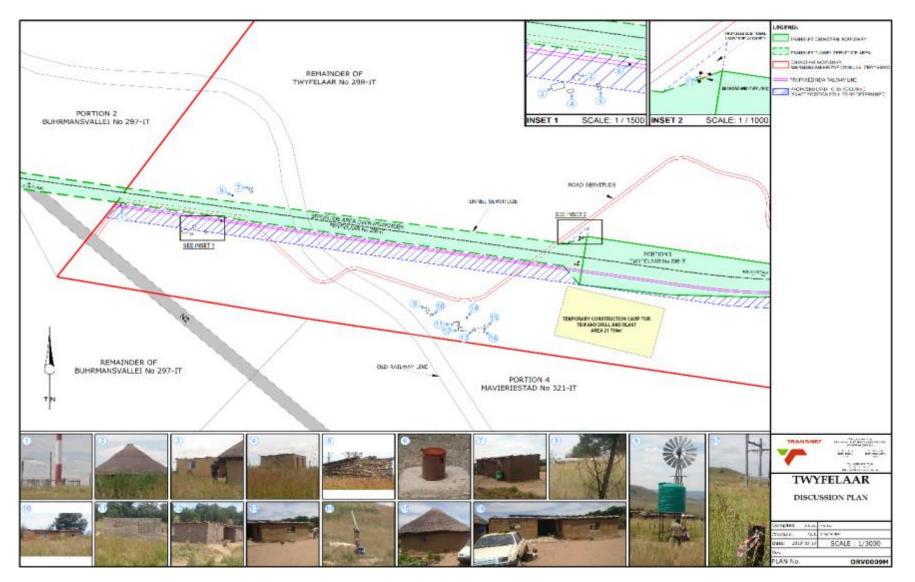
DISCUSSION PLAN SHOWING HOMESTEAD WITHIN PROPOSED SERVITUDE.
